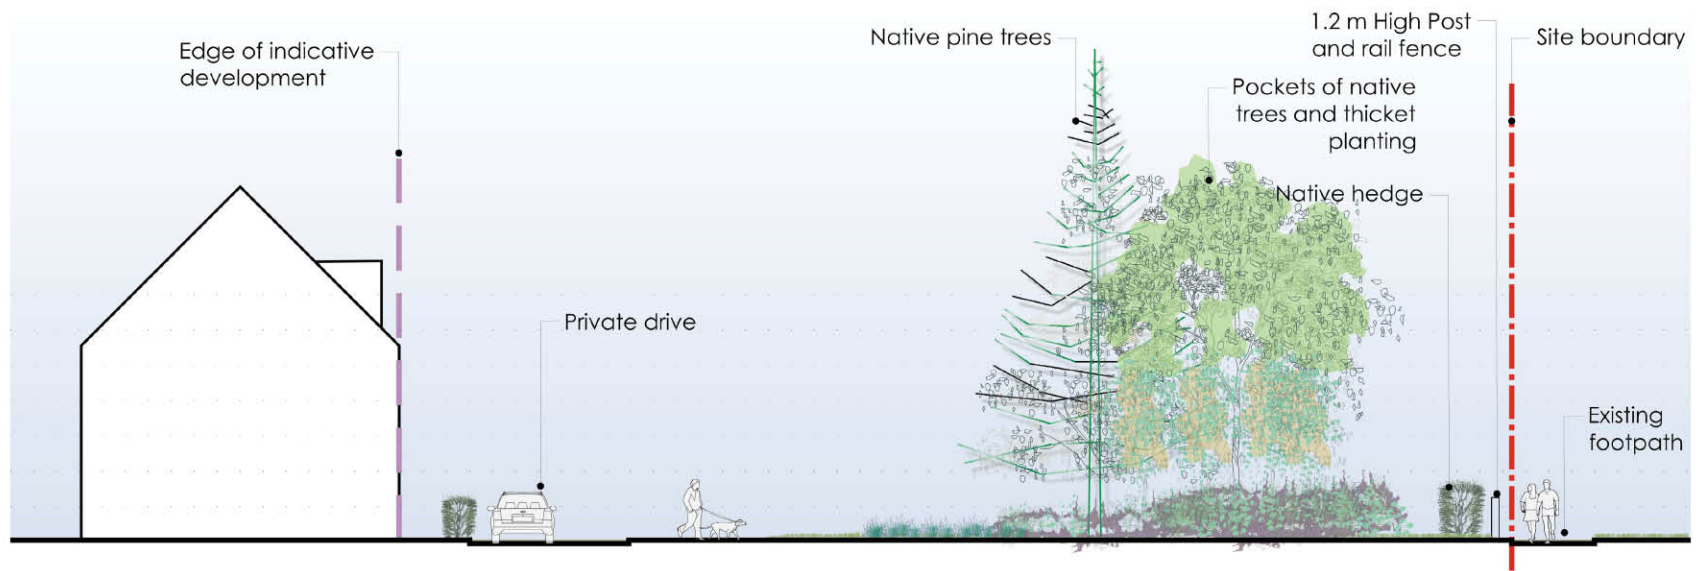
Illustrative Landscape Section C-CC Section Through Northern Boundary
